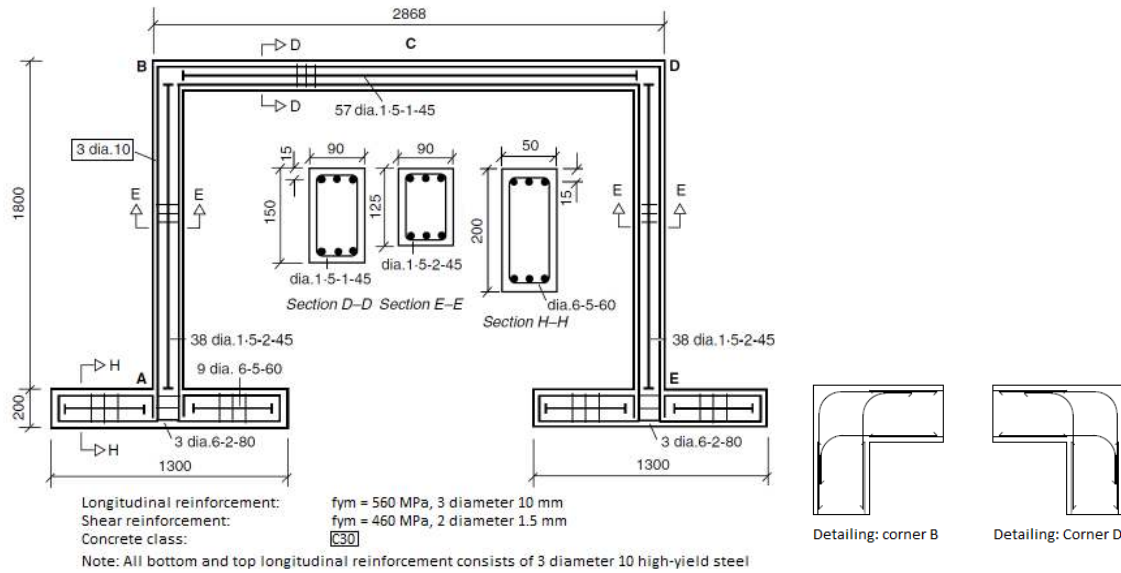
Design 1: longitudinal reinforcement diameter $d=10$ mm and concrete strength class: C30 (Blomfors, 2014).
